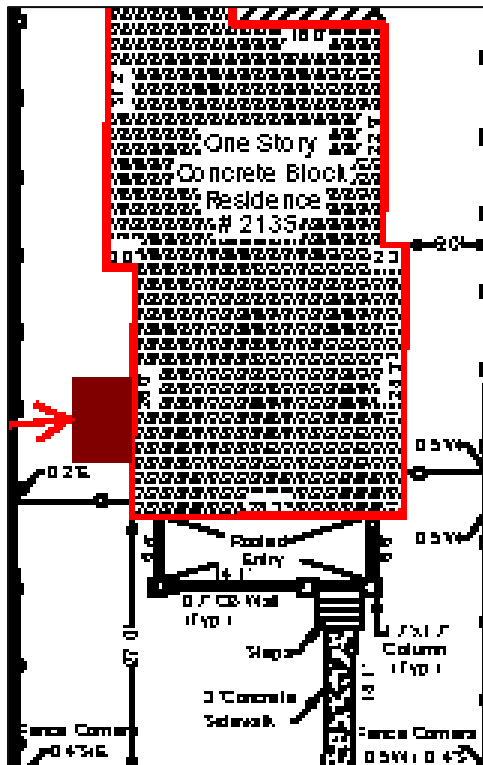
The red square indicates proposed landing and ramp location on west side of property. Ramp and landing will be located behind existing fence.
